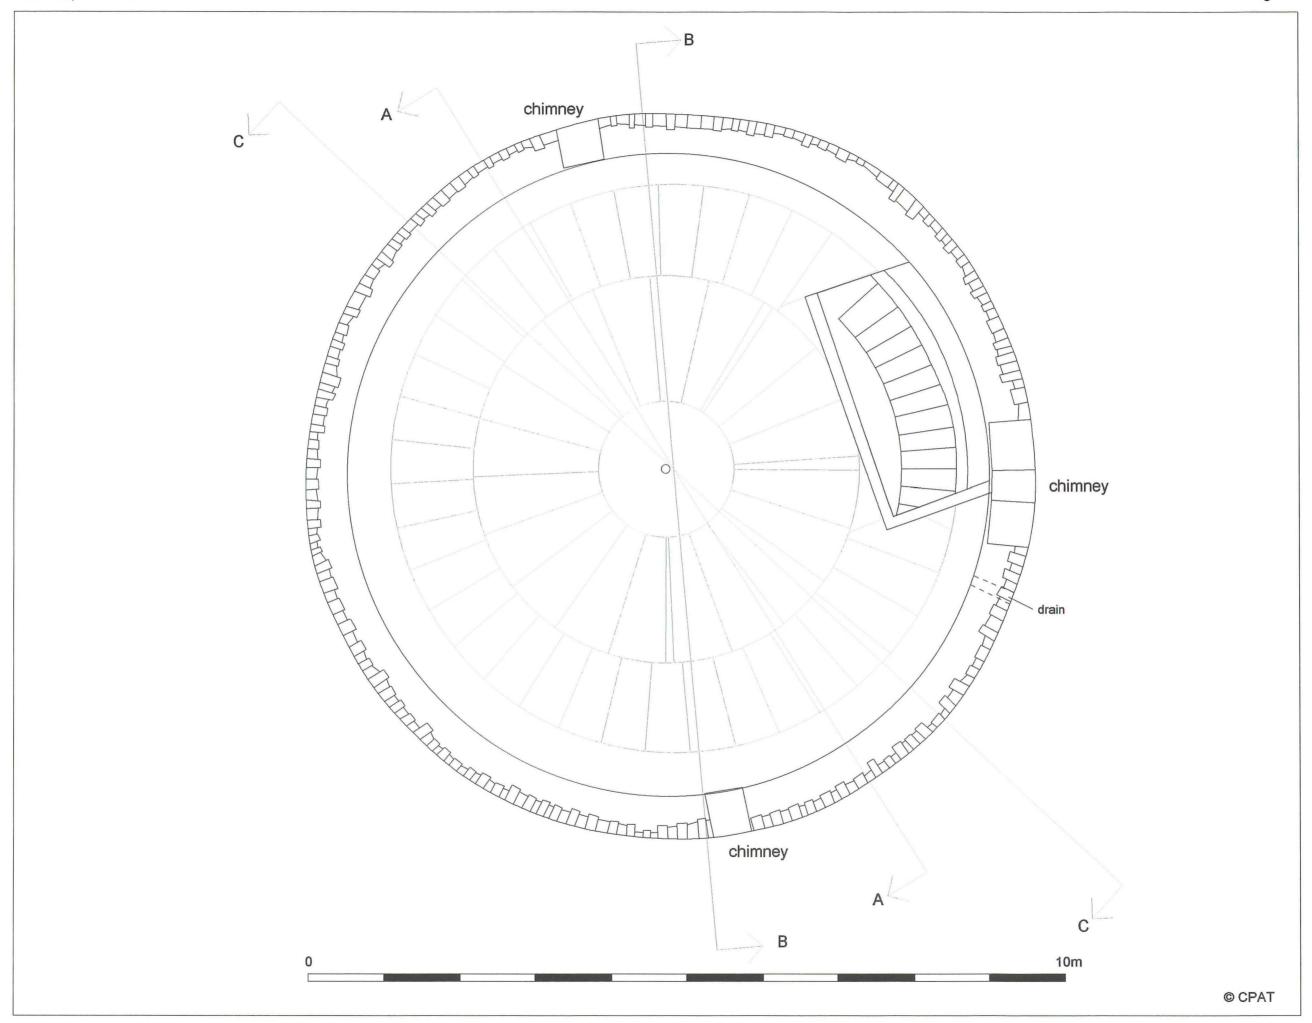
Roundhouse Farm north-east tower, roof plan showing segmented construction
